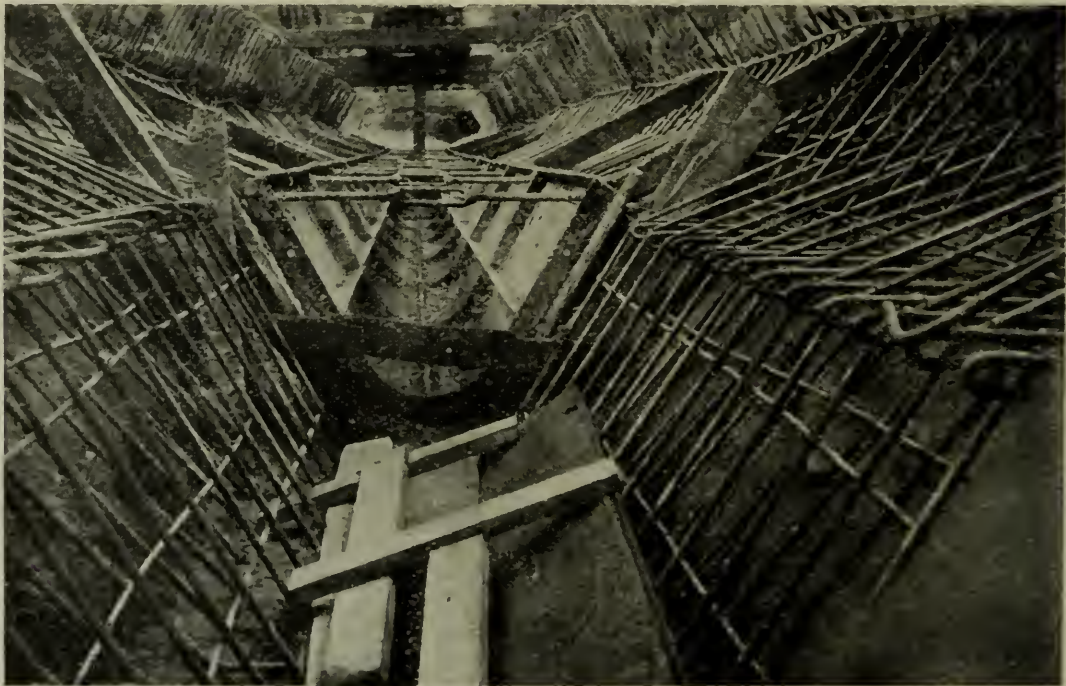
DUKE'S DITCH CULVERT, STEEL FORMS USED.
